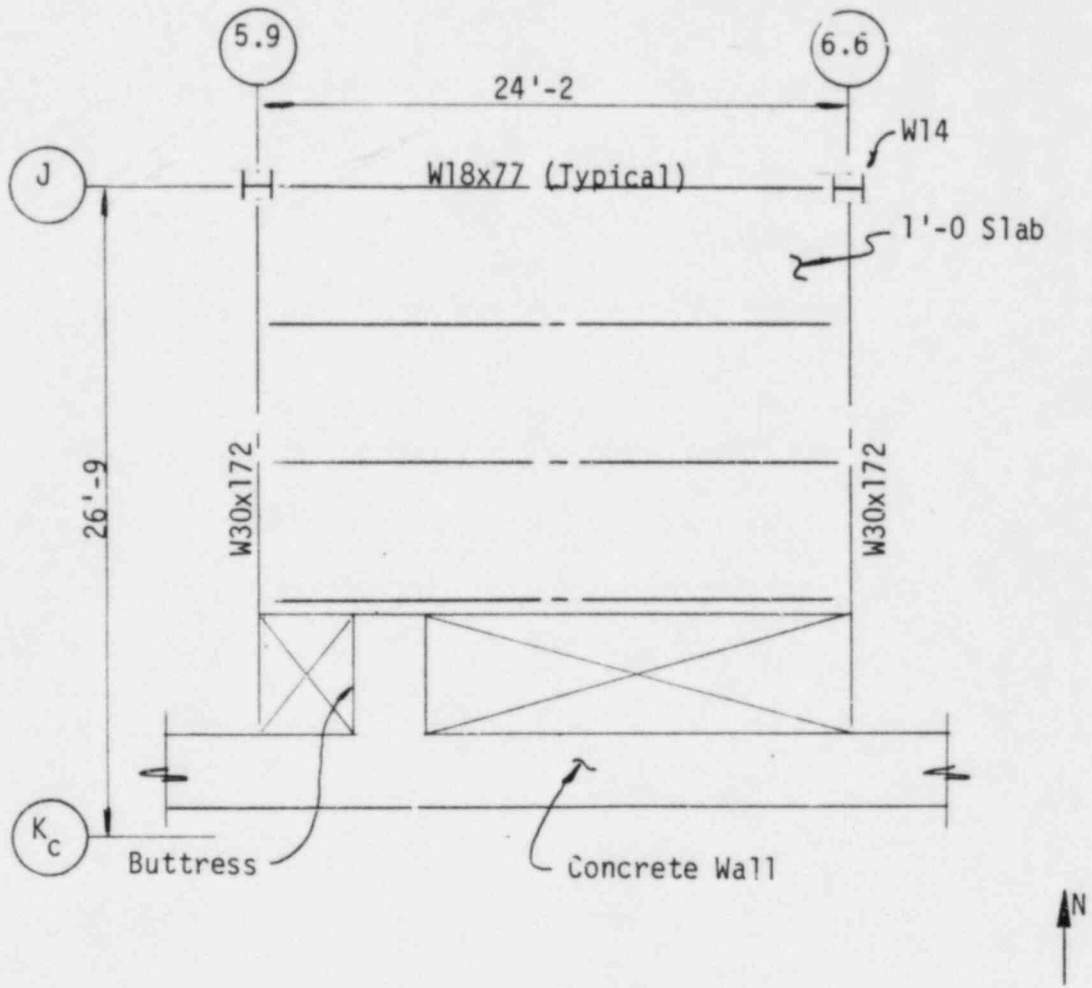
AUXILIARY BUILDING FLOOR AT ELEVATION 646'-0"
